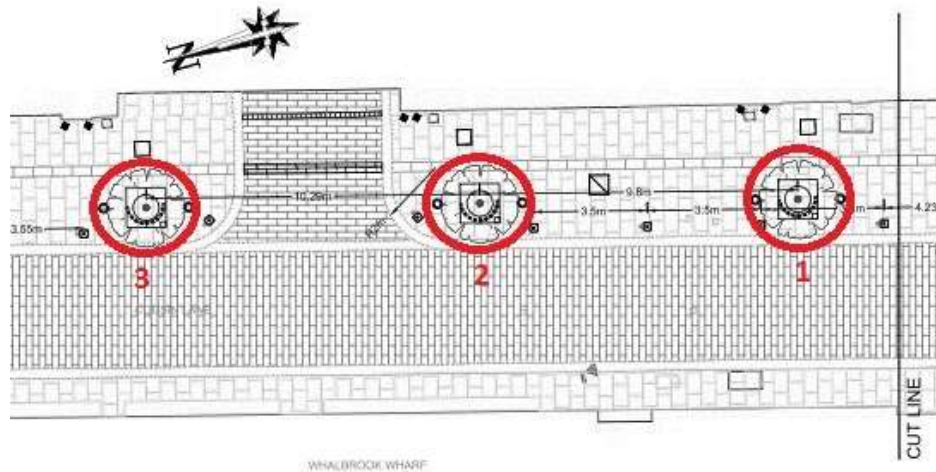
Locations of the pits as labelled. Adapted from a plan supplied by the City of London Department of the Built Environment.
